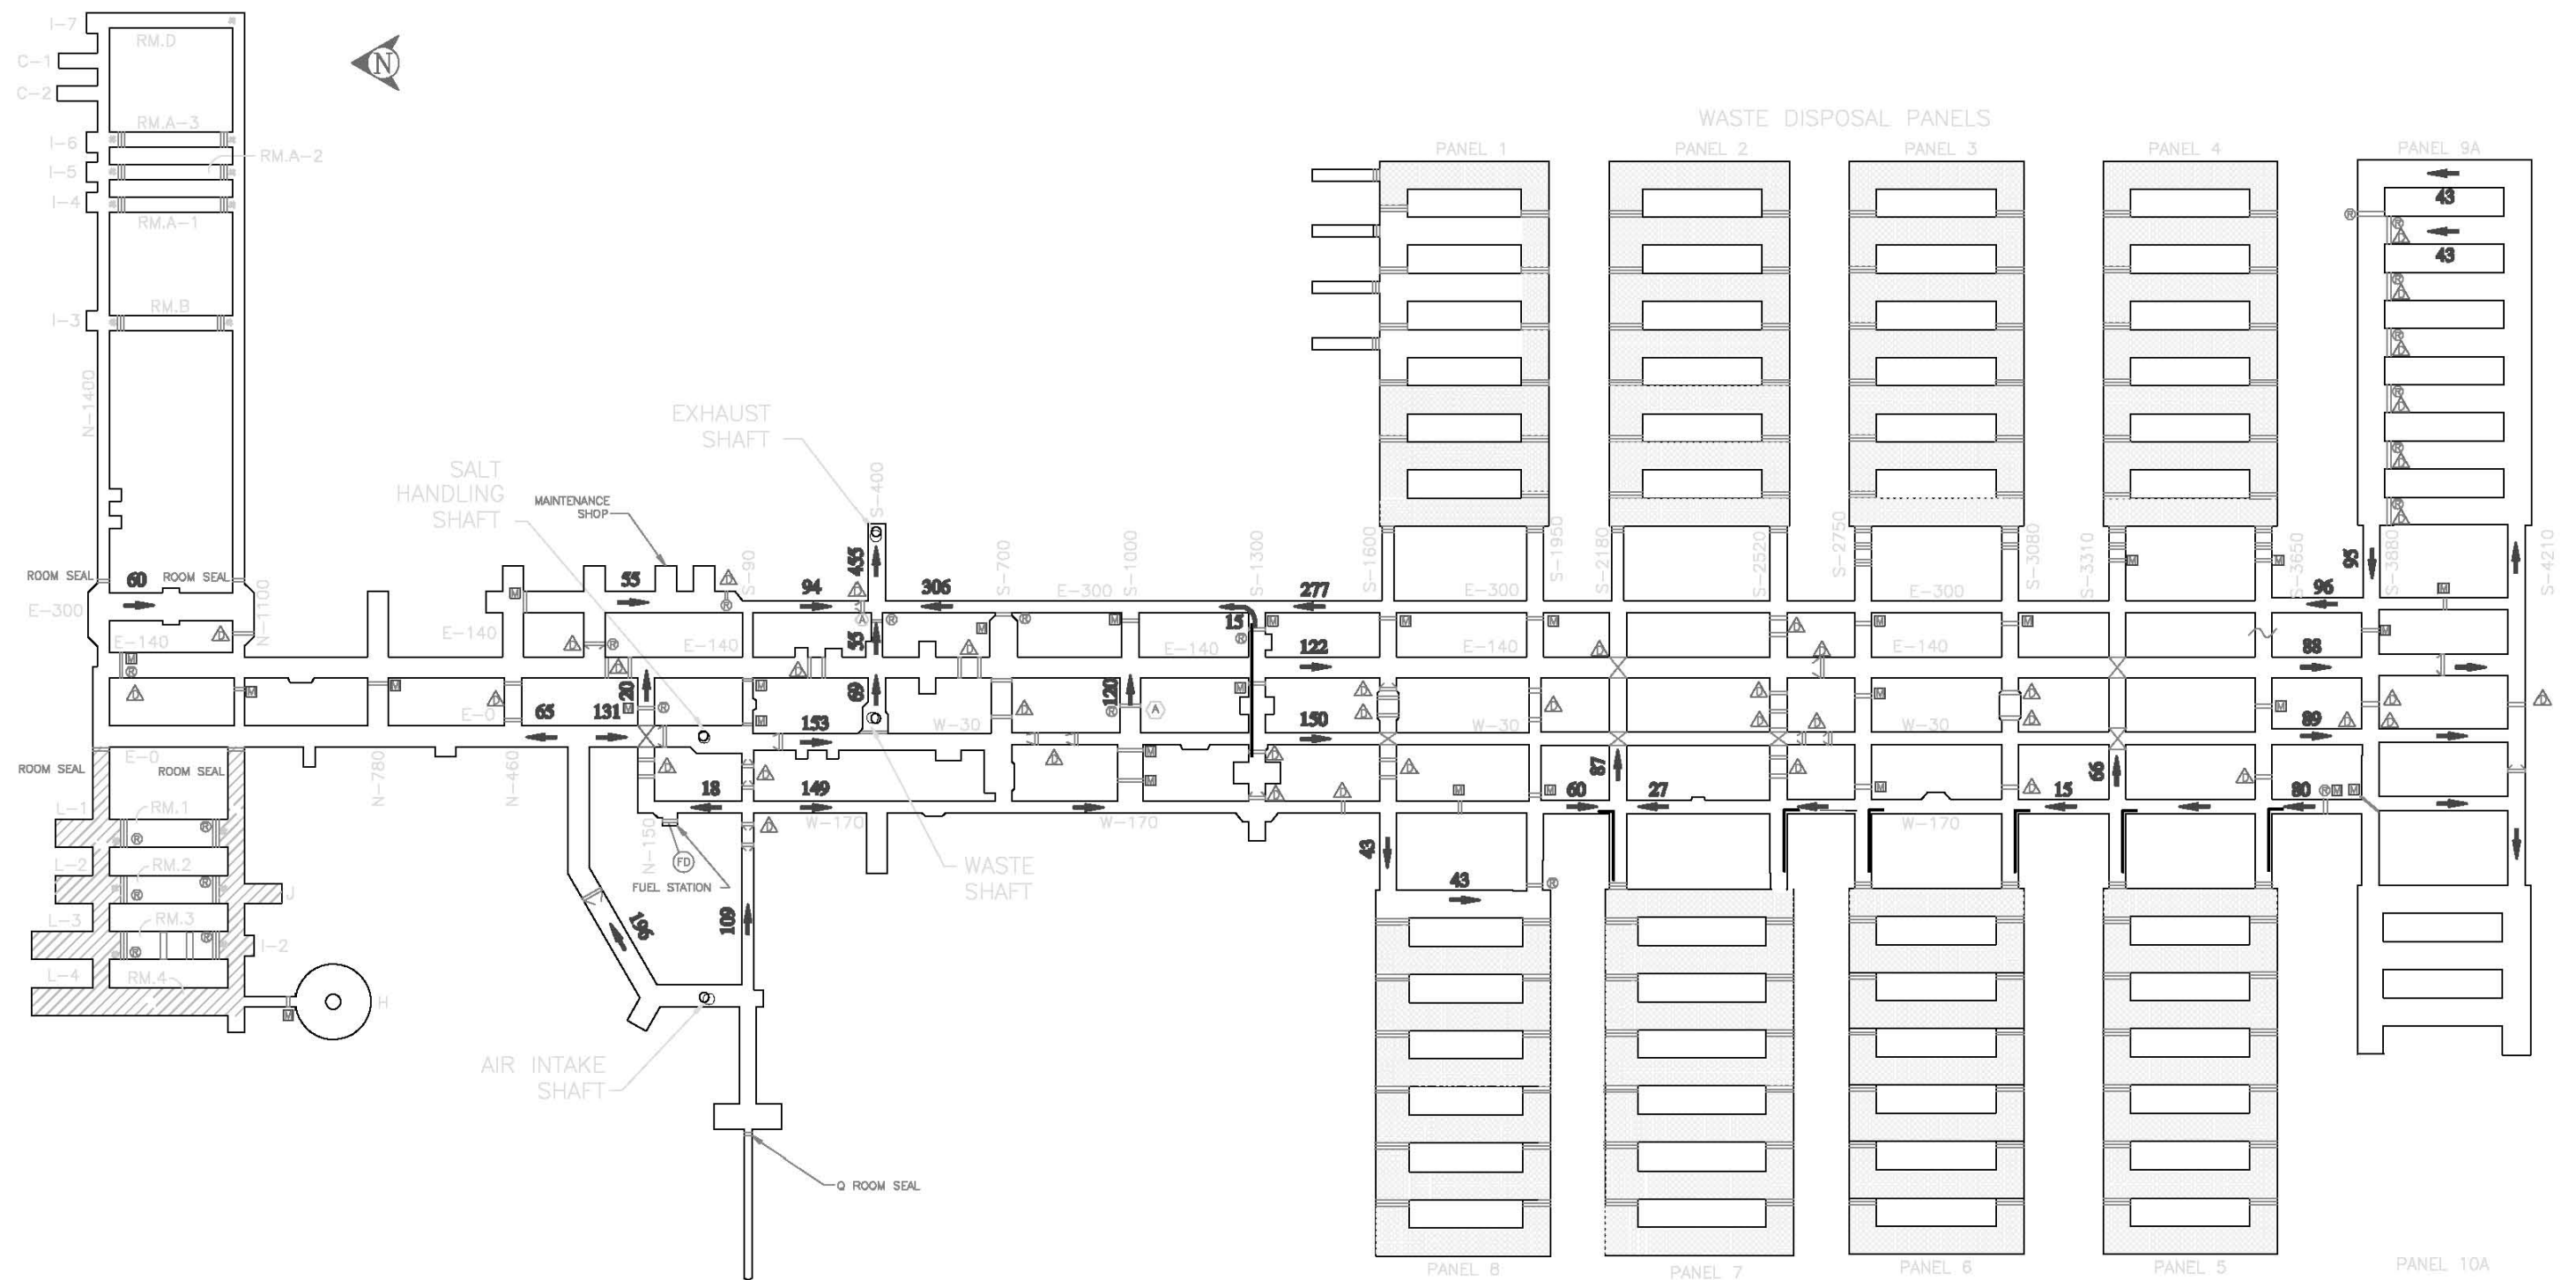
Underground Facility Infrastructure Locations and Primary Disposal and Truck Haulage Routes for the B-3 Ventilation Configuration.
